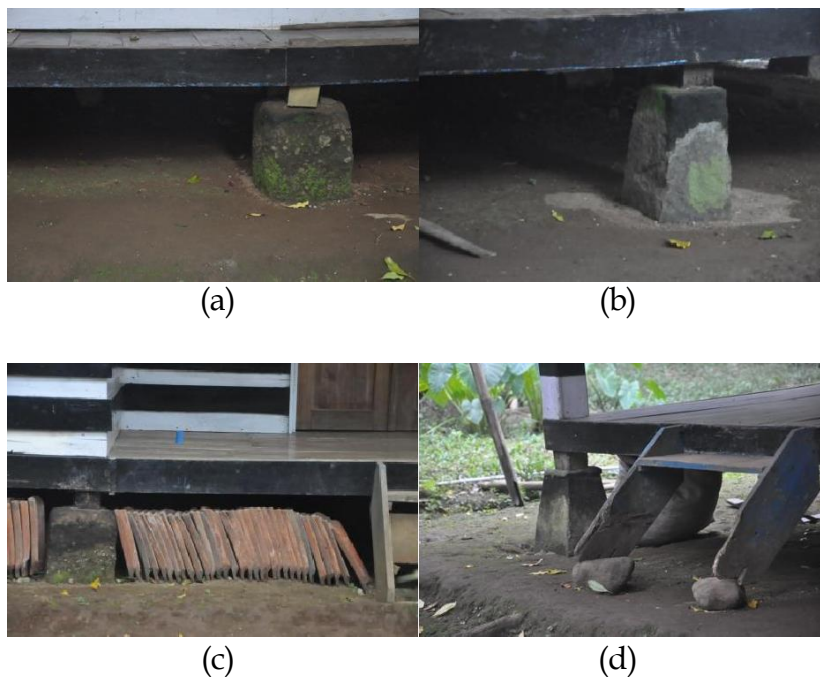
Foundation Construction. (a) form of *Pasagi* foundation; (b) the shape of the *Lisung* foundation; (c) the function under the house is to become a roof storage area; (d) steps to access the house (Author Documentation)
